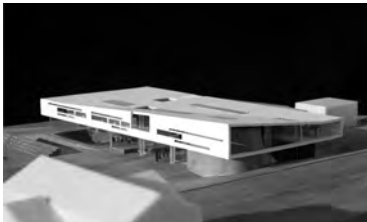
Arkalohori Town Hall, the perforated folded wall.
